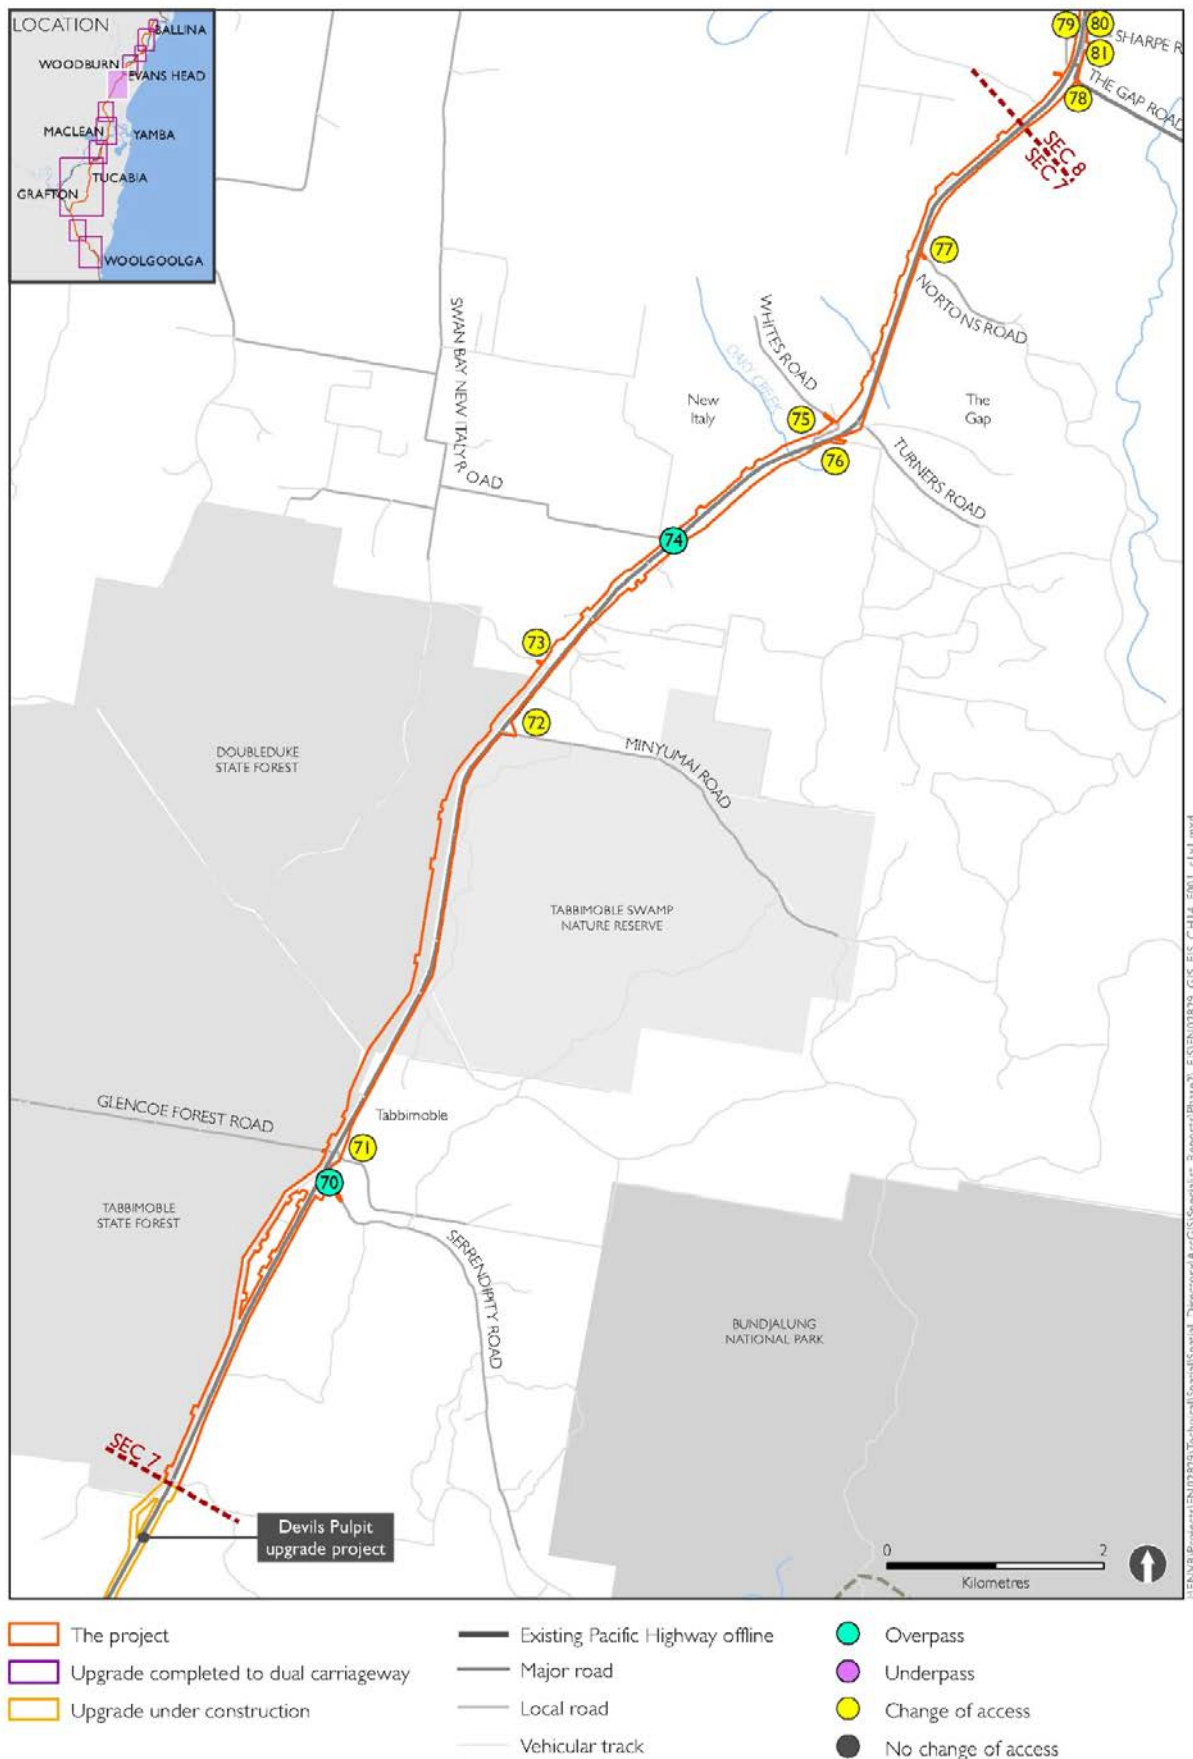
Locations of road alterations or changed access arrangements: Section 7
